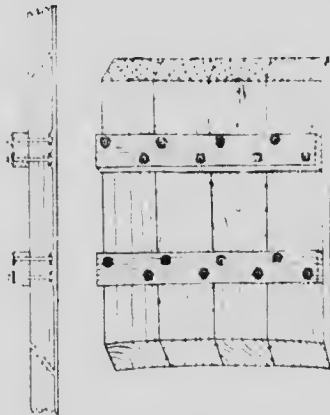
Showing one method of cutting out the doors in a stave silo.
